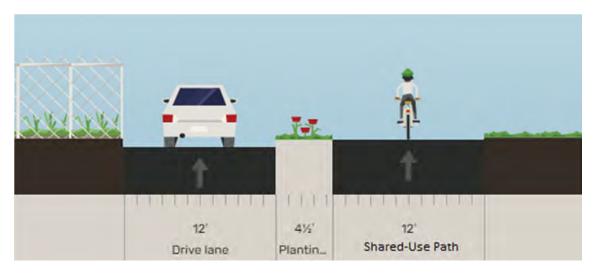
S Sprague Way Proposed Cross Section, North of Crossin (dimensions are approximate)
